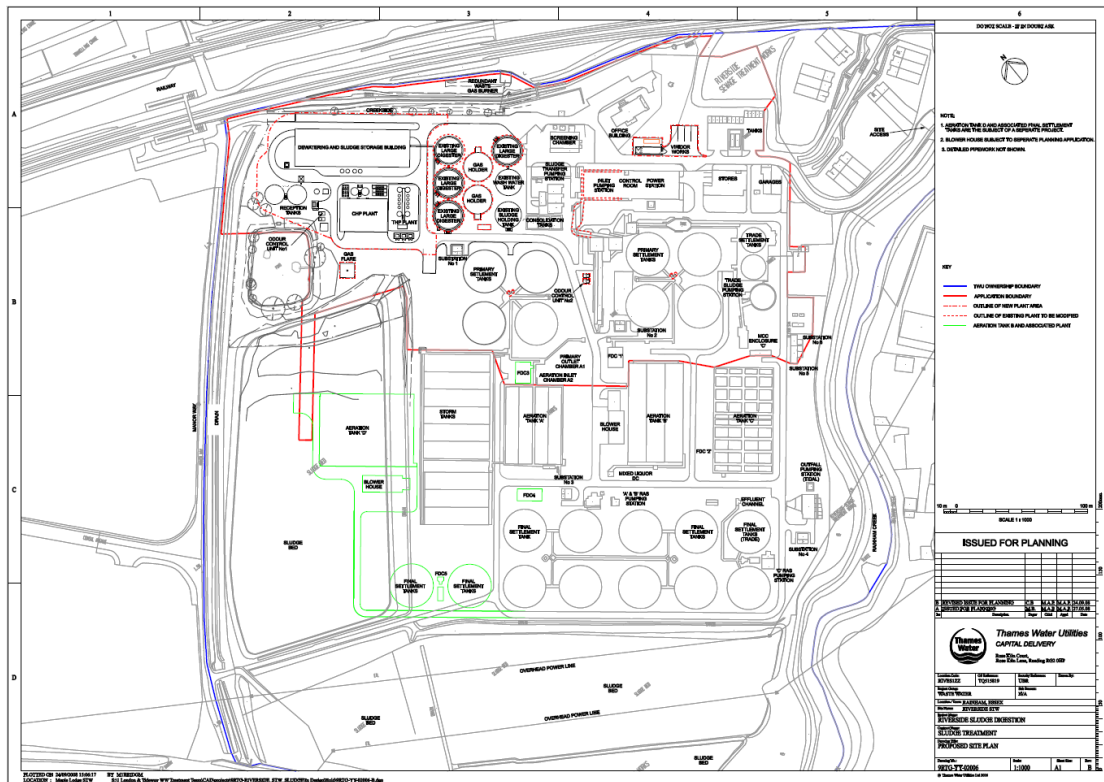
Planning Application U0005.08 – Upgrade Proposed site plan.
